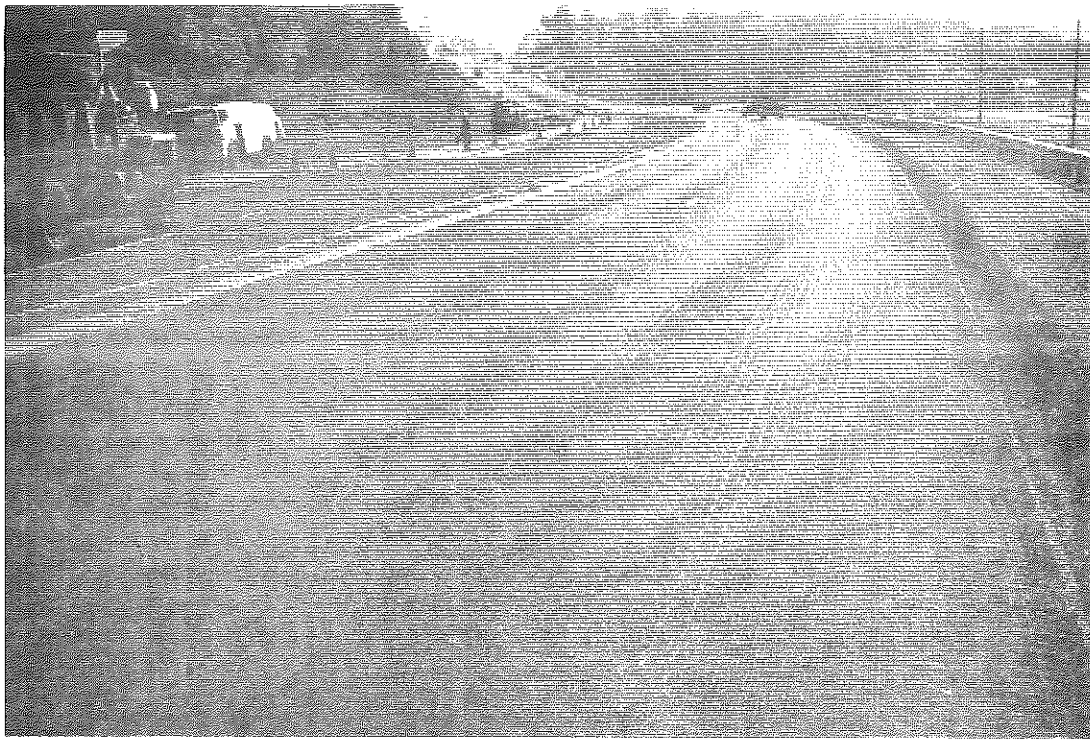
View of Milled Bituminous Surface; KY 80, Pulaski County.
